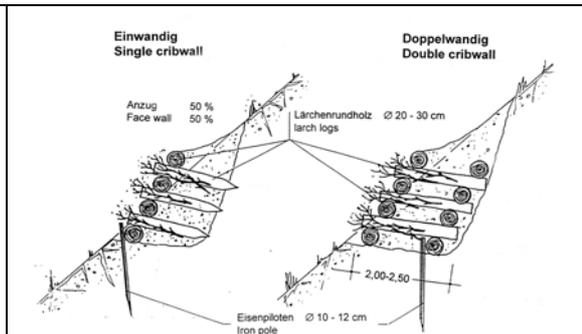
Wooden crib wall, cross section (IBLB, 1999)
